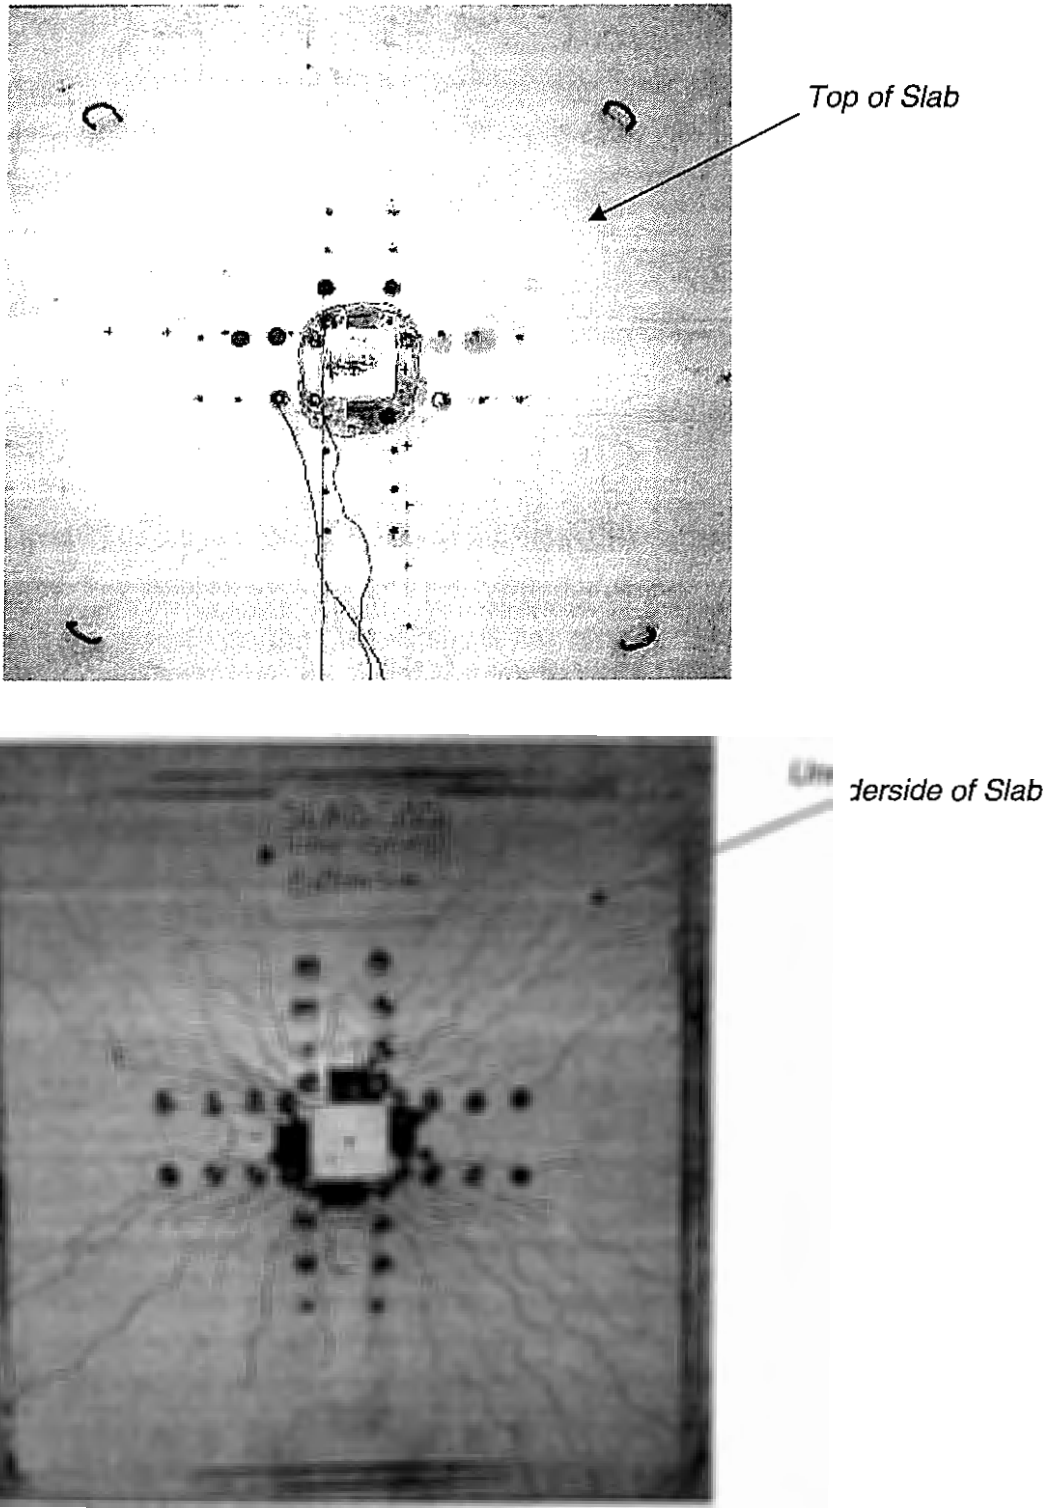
Crack Pattern after Failure of Specimen SB5
